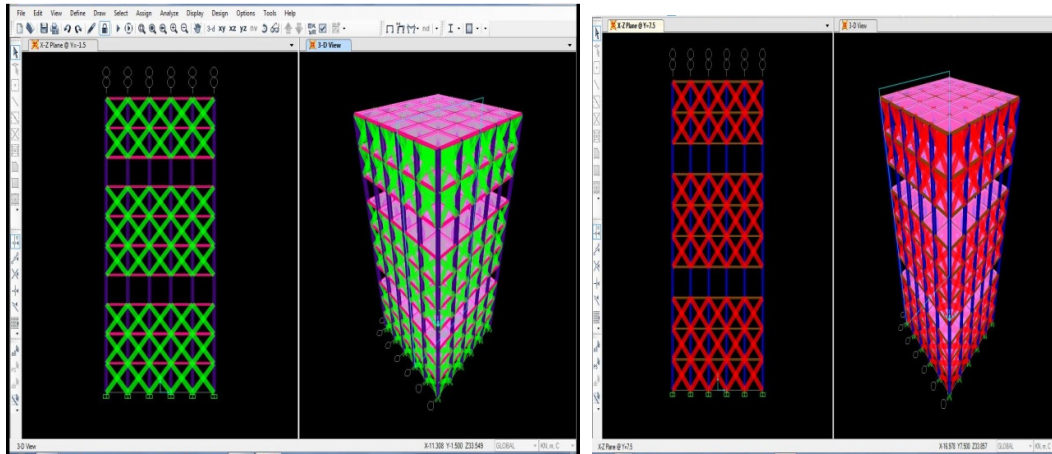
Elevation, 3D view of AAC block and Brick partially infilled steel building
